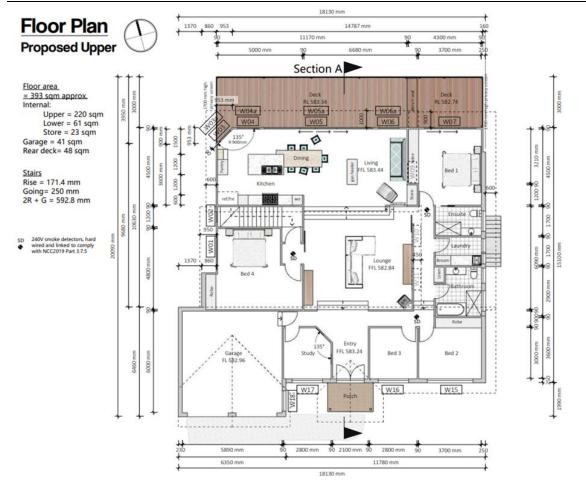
Proposed floor plan – upper (Source: PdD Building Design)
